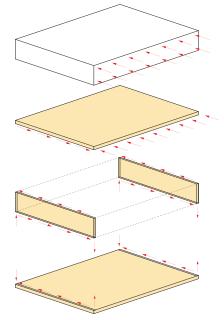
Diaphragm action between walls and floors Source: Drawn by the author
